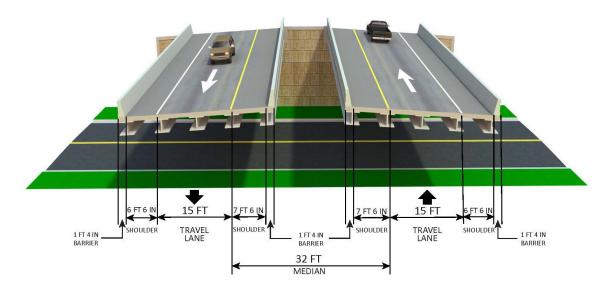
Proposed Connector Bridge Typical Section (Two-Lane Bridge)
